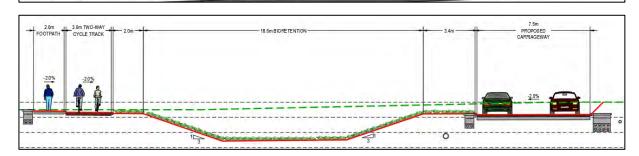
Zone F - Cross Sections of Proposed Access Road.
